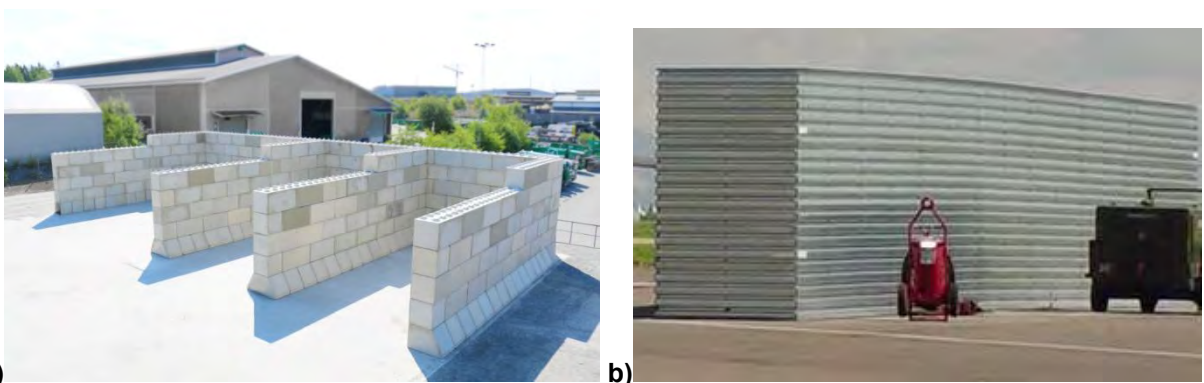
a) Block Moulds modular concrete blast wall [18] and b) BDI prefabricated steel blast wall (cropped from [15]).
